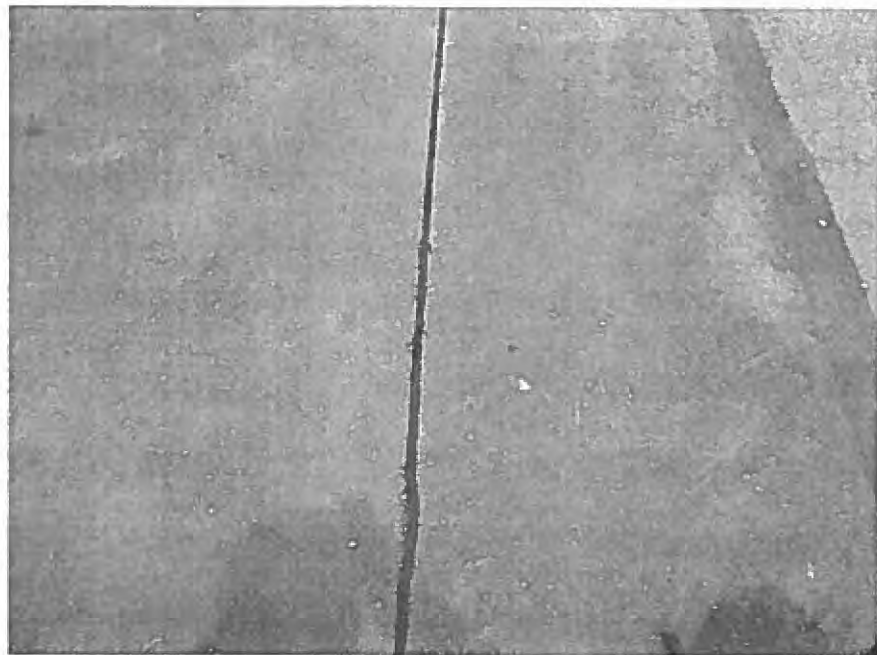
Cantilever Repair and Asphalt Replacement (5/14/19)
